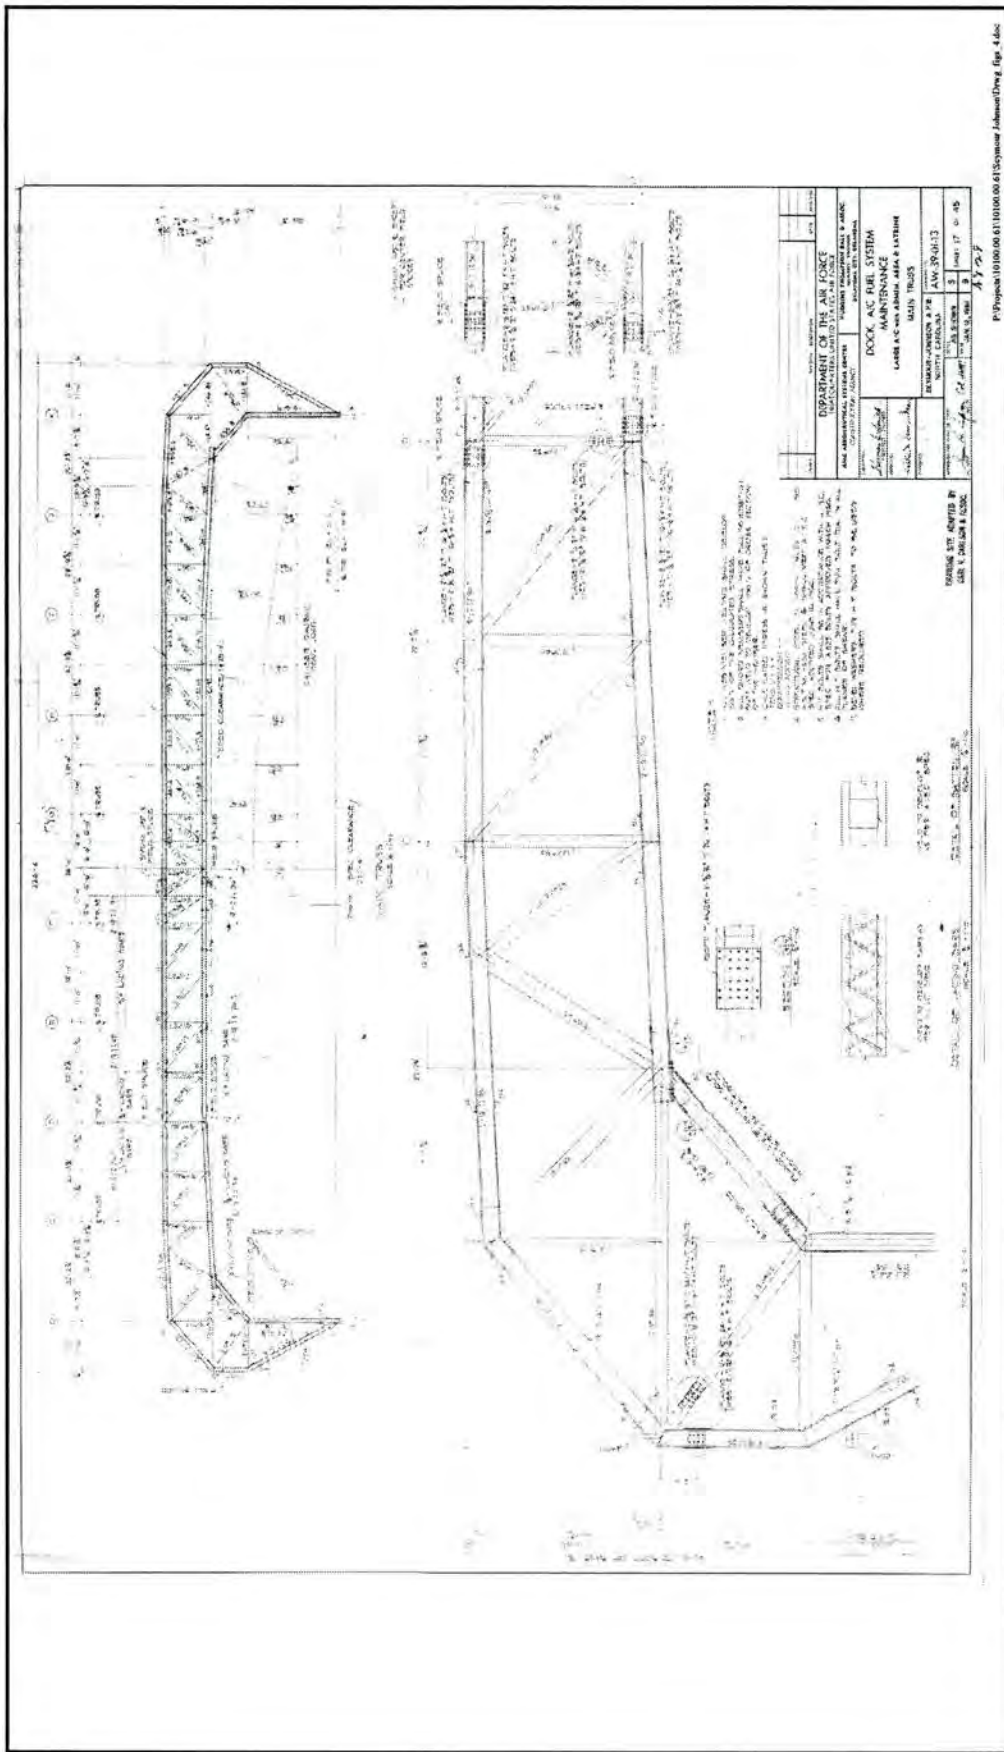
Building 4828—record drawing, main truss, 1961 (Source: Seymour Johnson Air Force Base Civil Engineering Vault).
